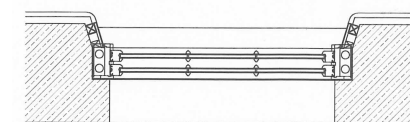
Plan at Jamb with Timber Bead As Existing 1:10
